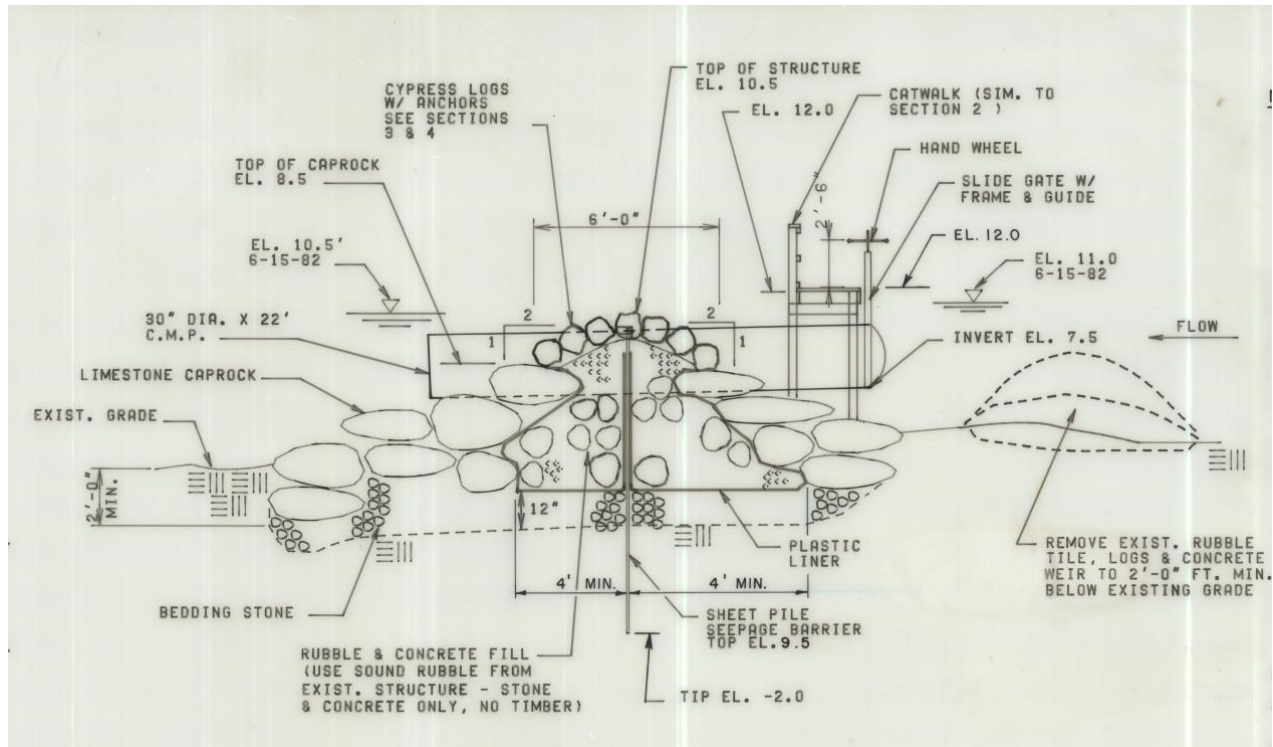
Existing Lainhart Dam Section (from 1986 replacement plans)
